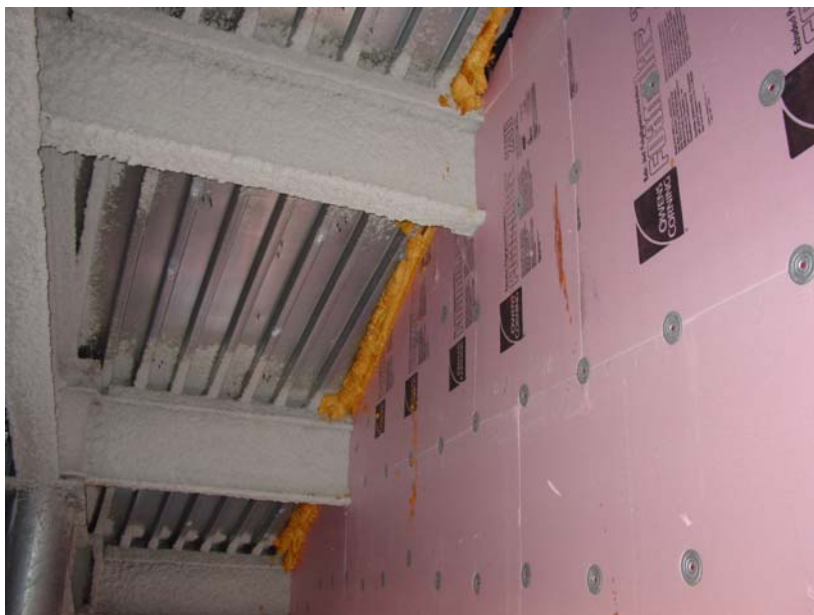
Modified detail of diagonal wall meeting underside of metal deck. Note foam filling flutes of deck.
